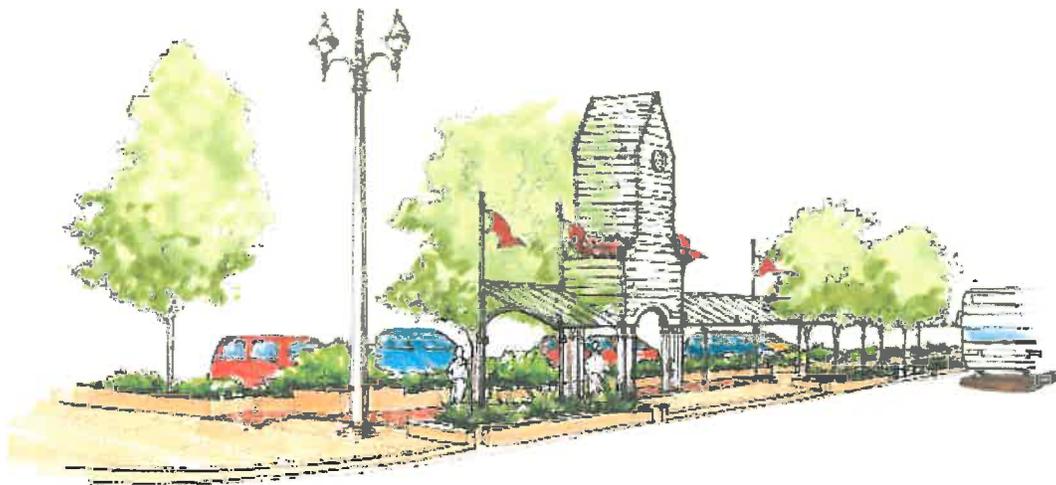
Cross Section for Preferred Streetscape Alternative (1<sup>st</sup> Street to 6<sup>th</sup> Street)
